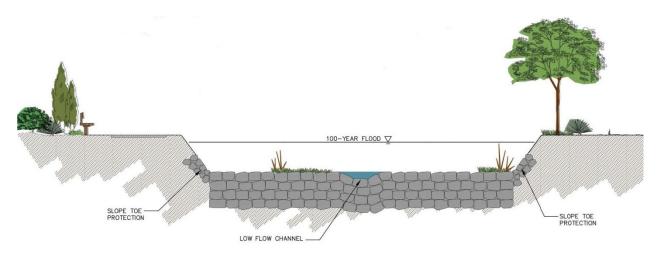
Engineered Channel with Large Drop Channel - Cross Section
